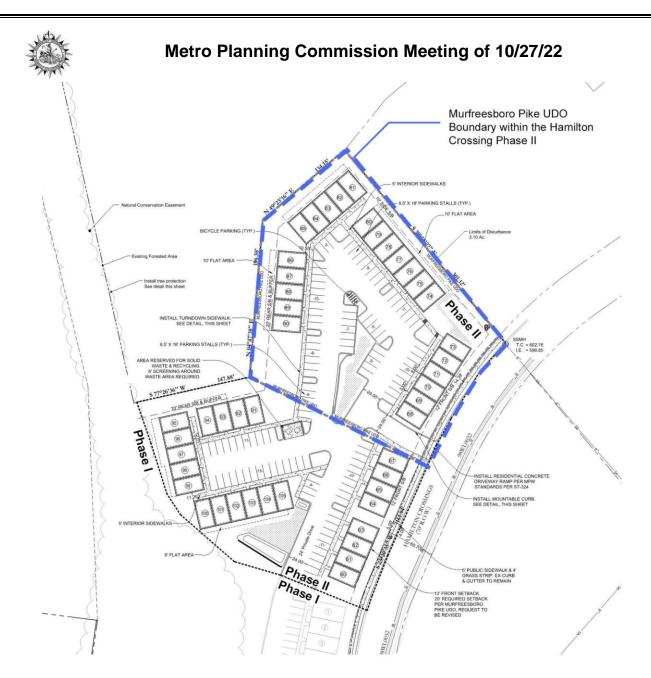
Proposed site plan of Hamilton Crossing Phase II with the Murfreesboro Pike UDO boundary.
